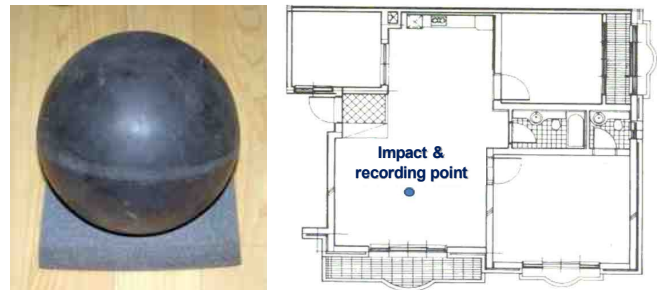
Rubber ball and floor plan of apartment unit where rubber ball impact sound recorded
